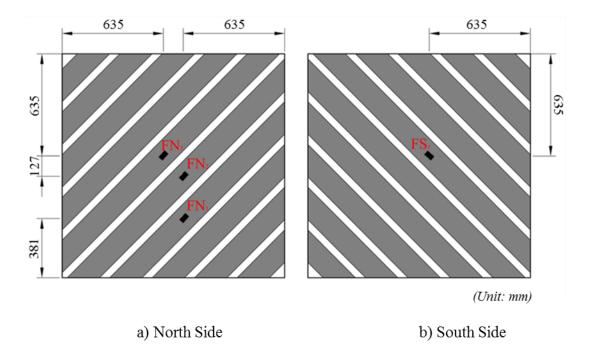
Strain gauge layout on FRP sheets of panel specimens
